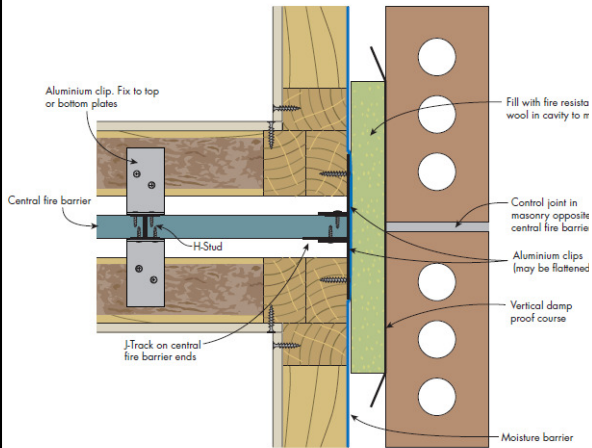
InterHome Wall to External Brick Wall Timber Frame - FRL 60/60/60
